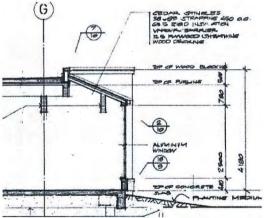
Original cedar shingle roof (from Howard Yano Architects).
